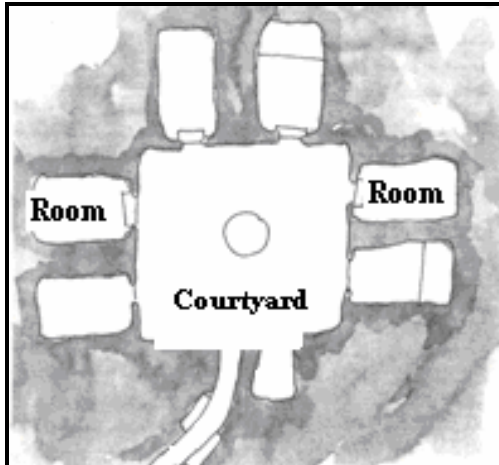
Plan of a troglodyte in Gharyan. (Scale not known)
